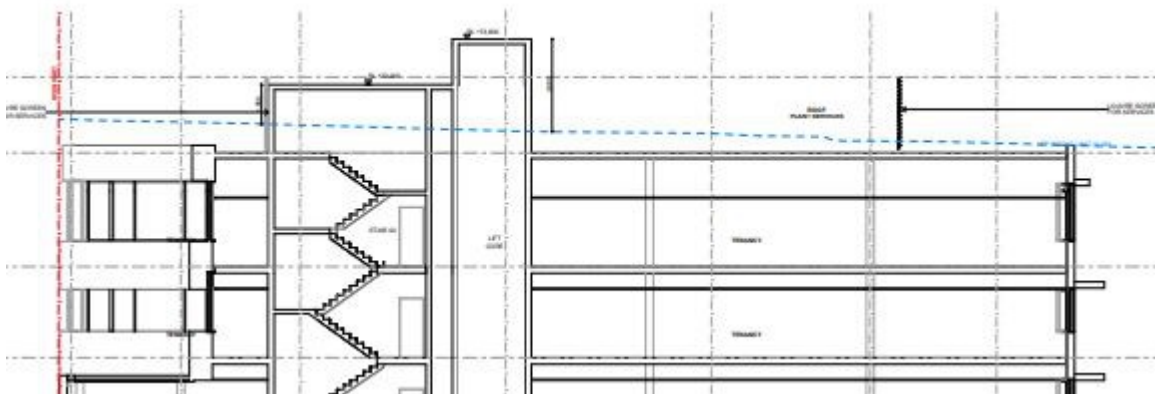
Roof Plan Showing Position of Structures Referenced Above
